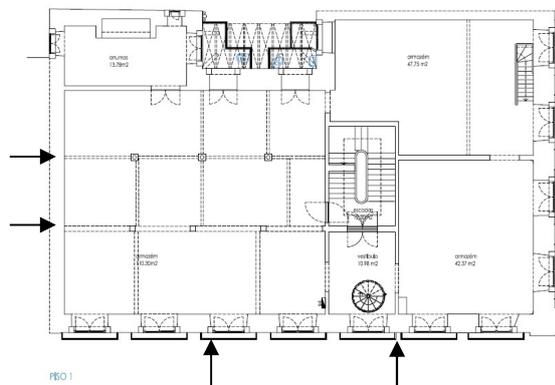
View of the case study building. Plan of Floor 1. Original location of the timber framed walls (frontal walls).
